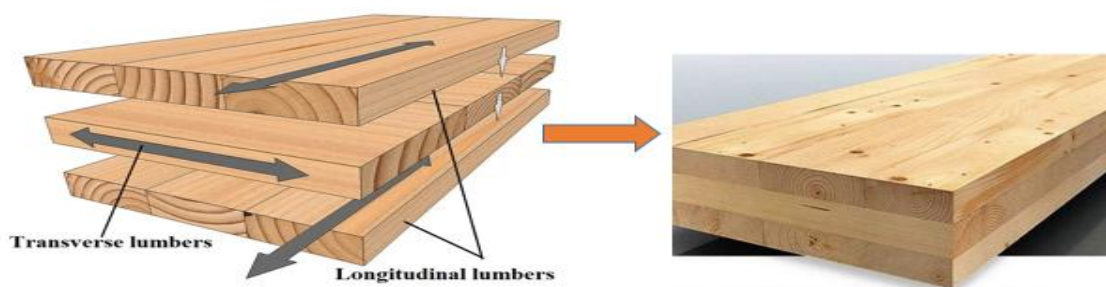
Conventional assembly layout and gluing of lumbers to produce CLT panels
